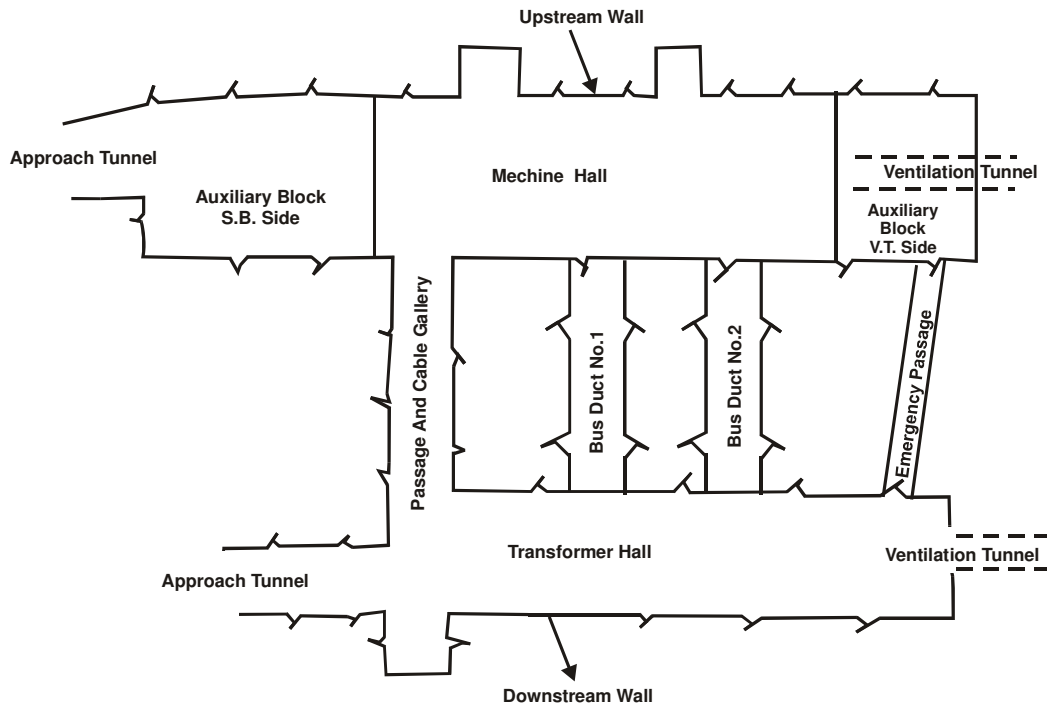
Layout plan showing the GHEP caverns and intersections
